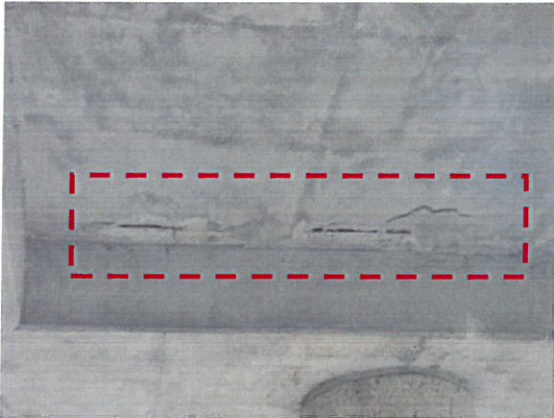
Concrete spall on underside of slab on pedestrian bridge
